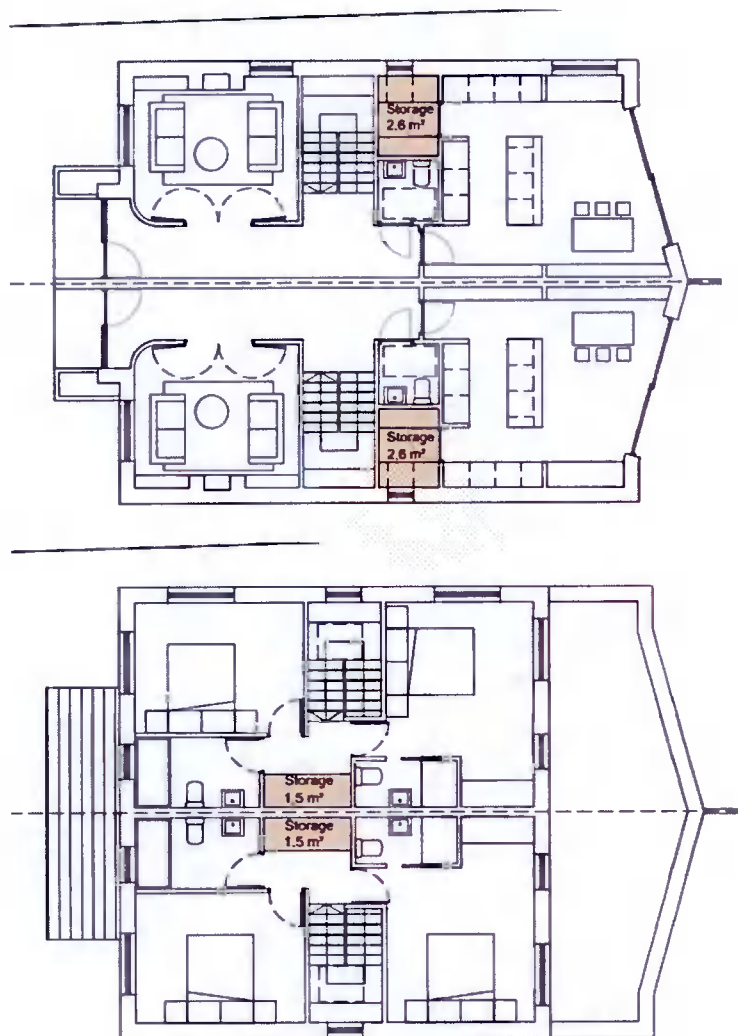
Proposed Floor Plans highlighting storage areas on both floors totalling 4.1m²
